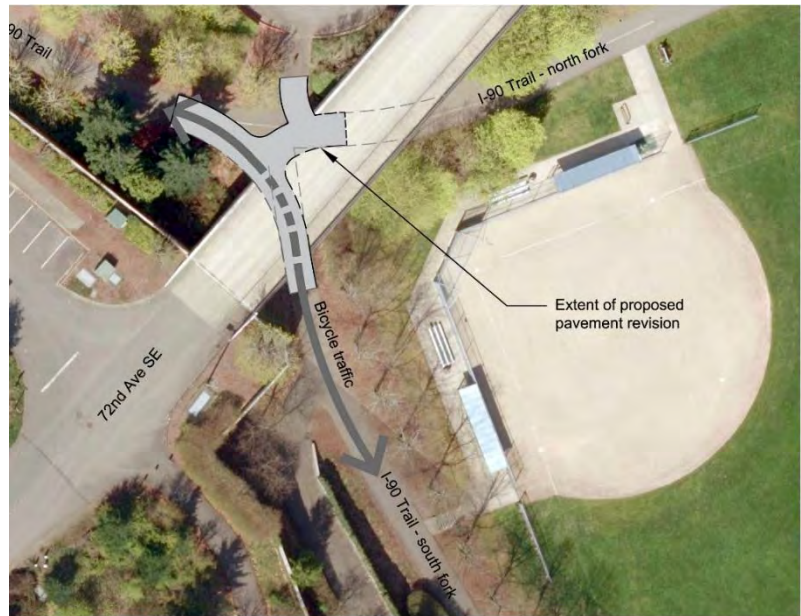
Pavement revised to route bicycle traffic to park's south edge
